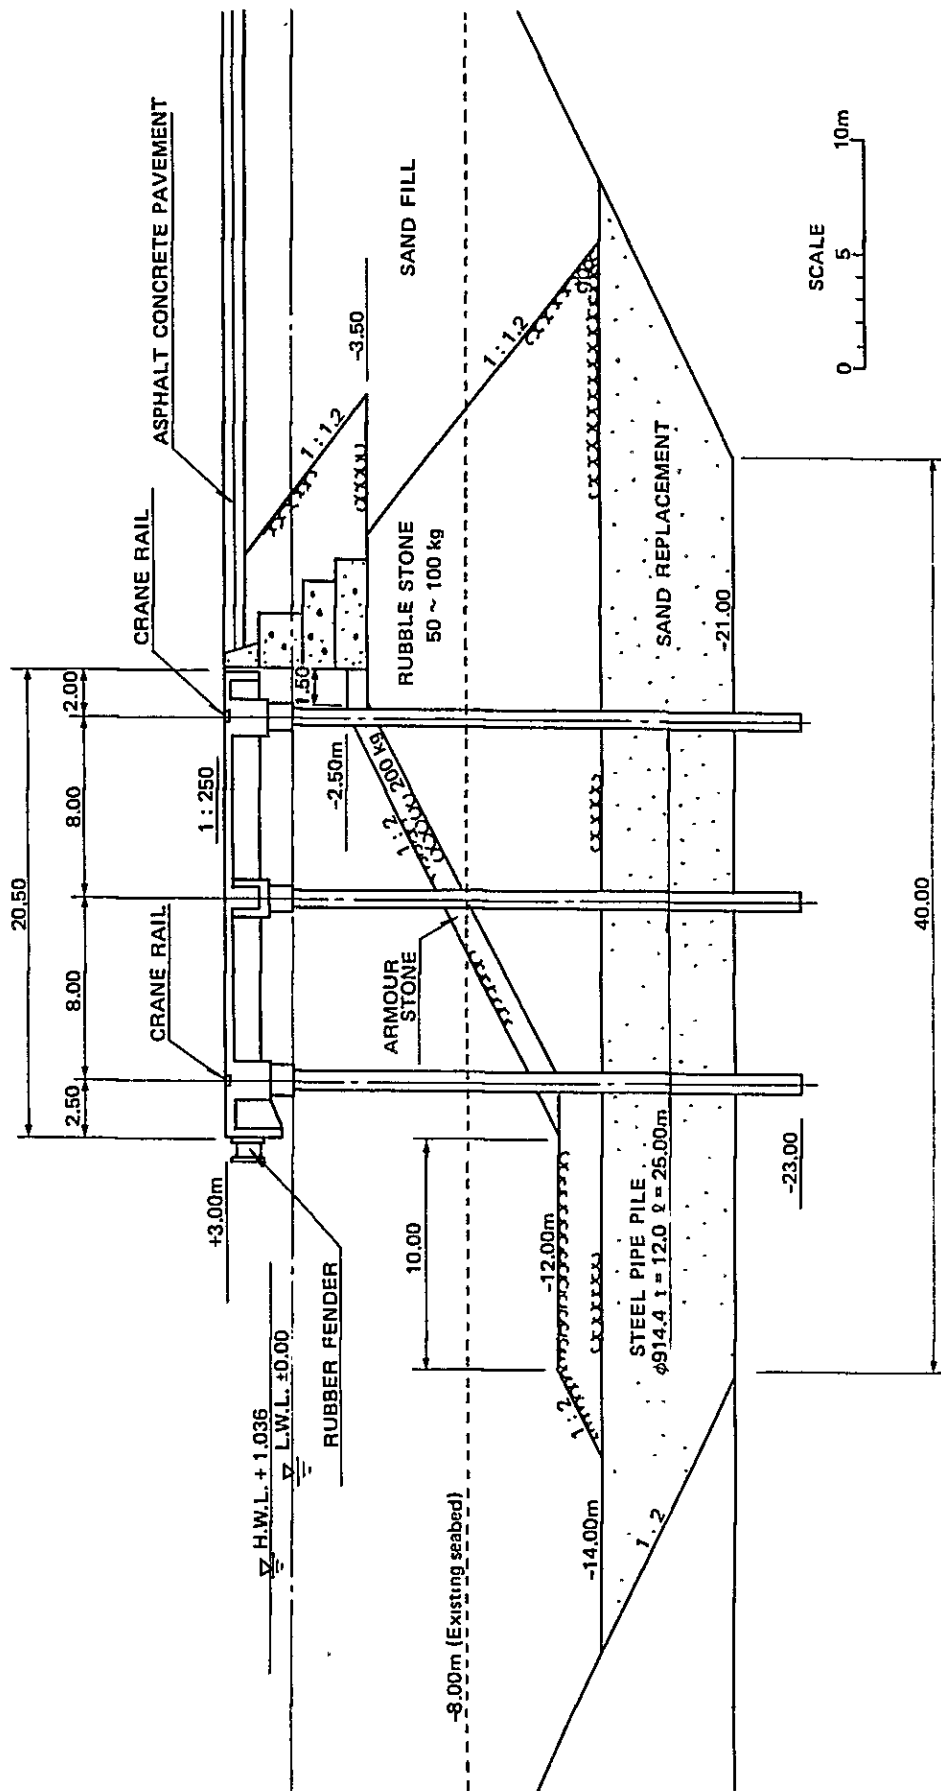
Container Berth Piled Wharf (Steel Pipe Pile Supported Platform)
